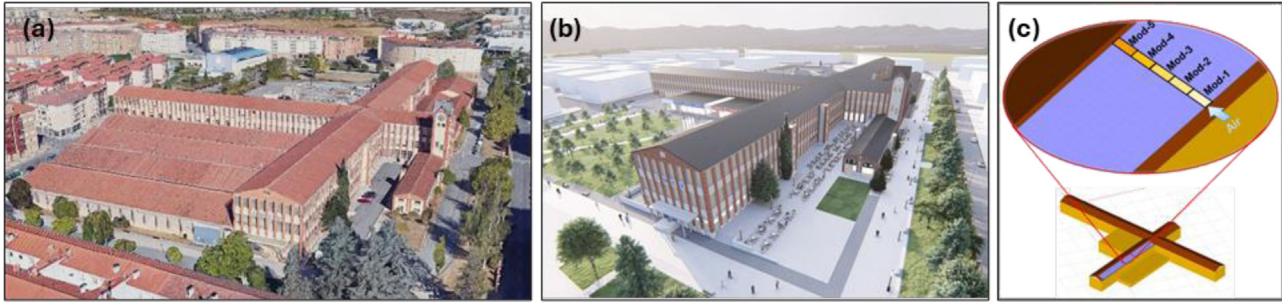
(a) Aerial photograph of IWER building before renovation; (b) Digital image of future renovated IWER building (reproduced with permission of Obras Especiales); (c) Render of the building and roof section under study.
